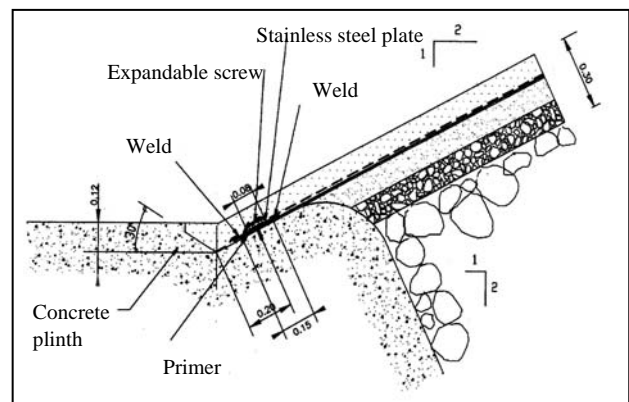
Details of the connection of the geomembrane to the concrete plinth
